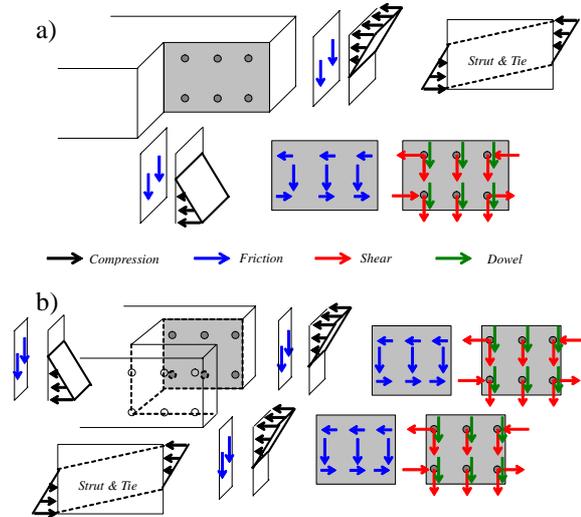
Assumed forces at connection of a one-arm beam No.1-1 (a) and a two-arm beam No.1-2 (b)
